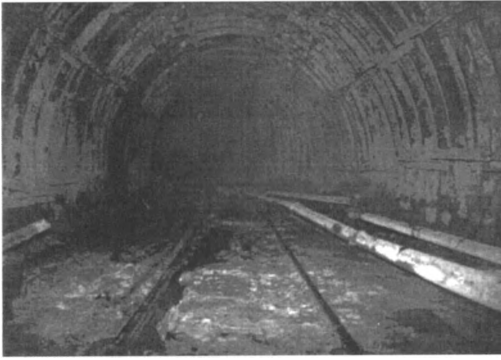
Condition of the main air roadway support by two-dimensional yieldable floor beams.
